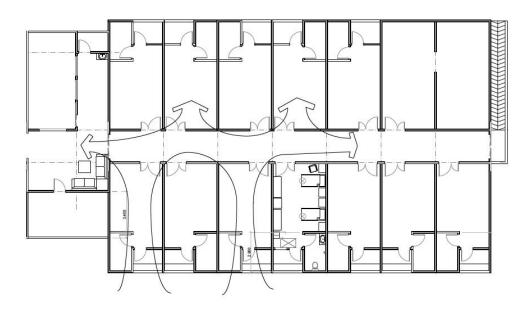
Floor plan and airflow direction hospital F airborne infection isolation (AII) ward
